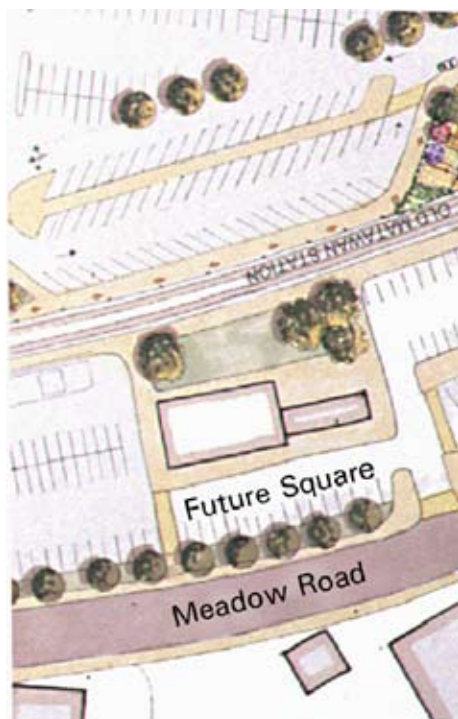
Site-Plan - Proposed Station Pedestrian and Drop-Off Improvements
